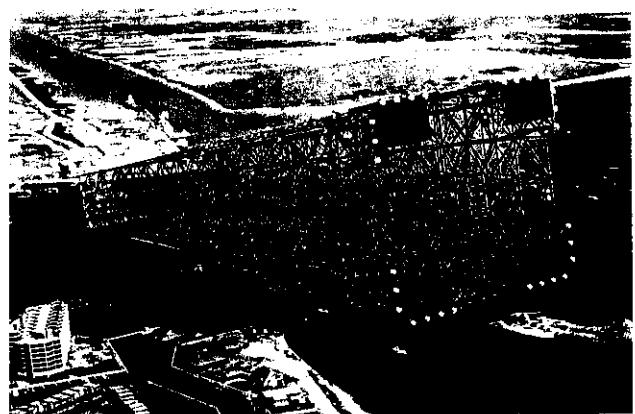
Jacket structure for large-scale deep water platform in Bullwinkle Project
